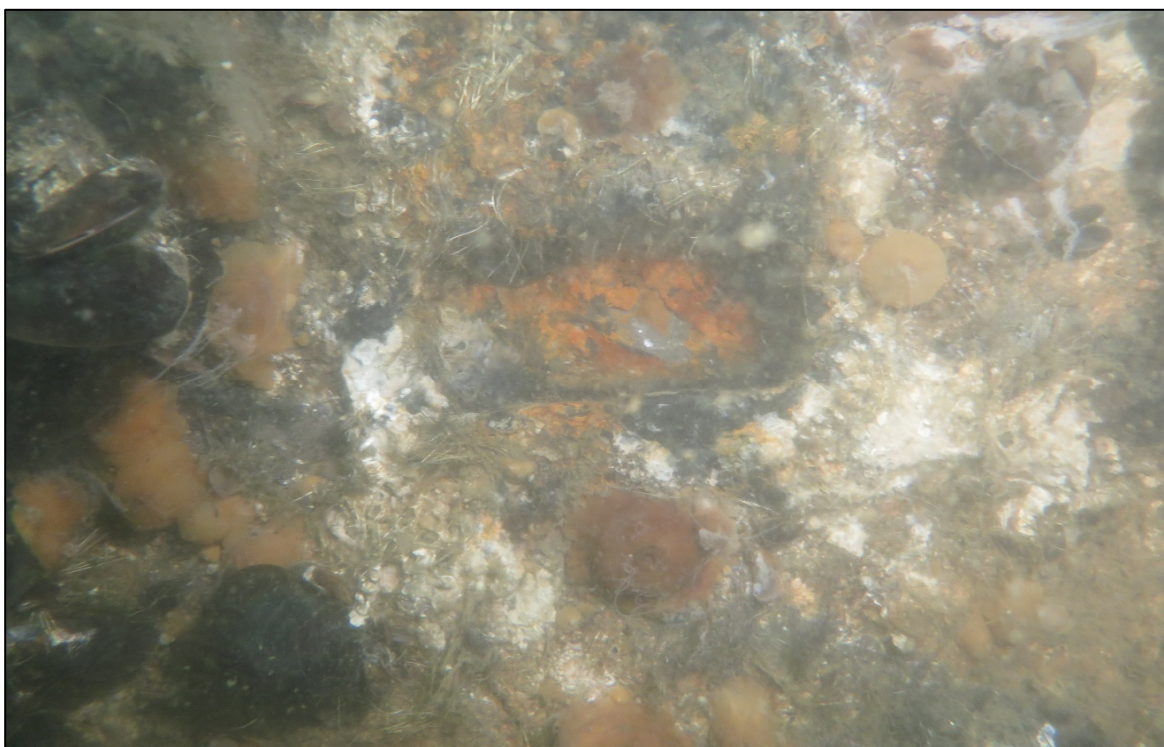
Anchor bolt and bottom bracket are missing exposing recess in the concrete, Diffuser E27 southwest bolt.
